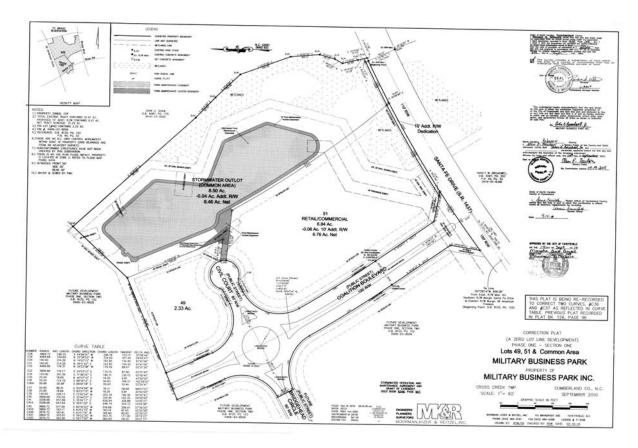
Example Final Plat showing the permanent maintenance access easement to the BMP as well as the permanent drainage easement around the BMP
